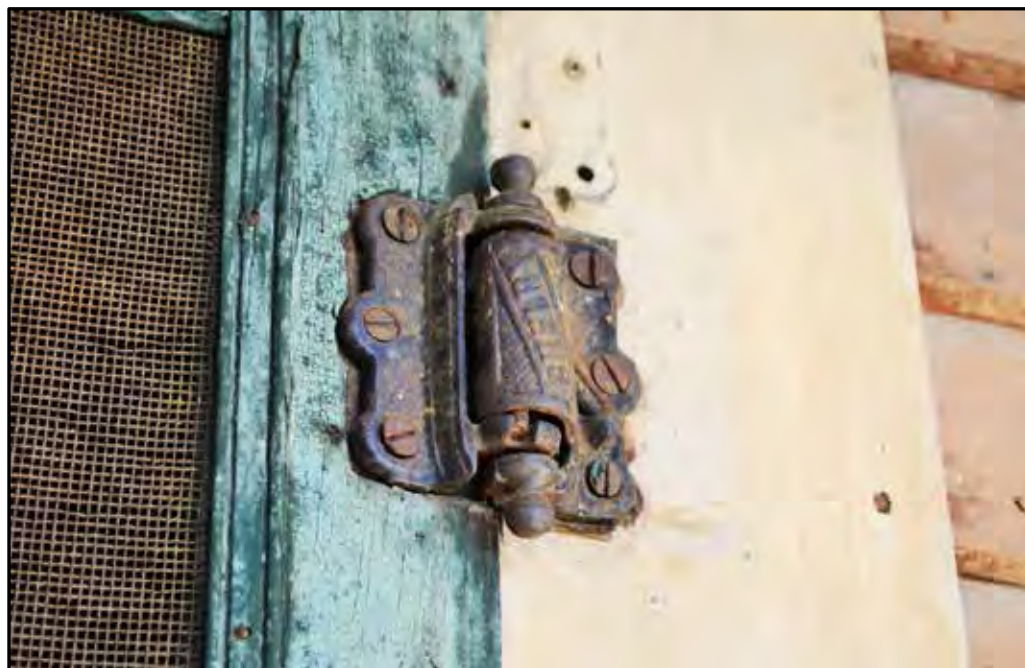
1890s Farmhouse, detail of east/front screen door hinge; view to the west.
